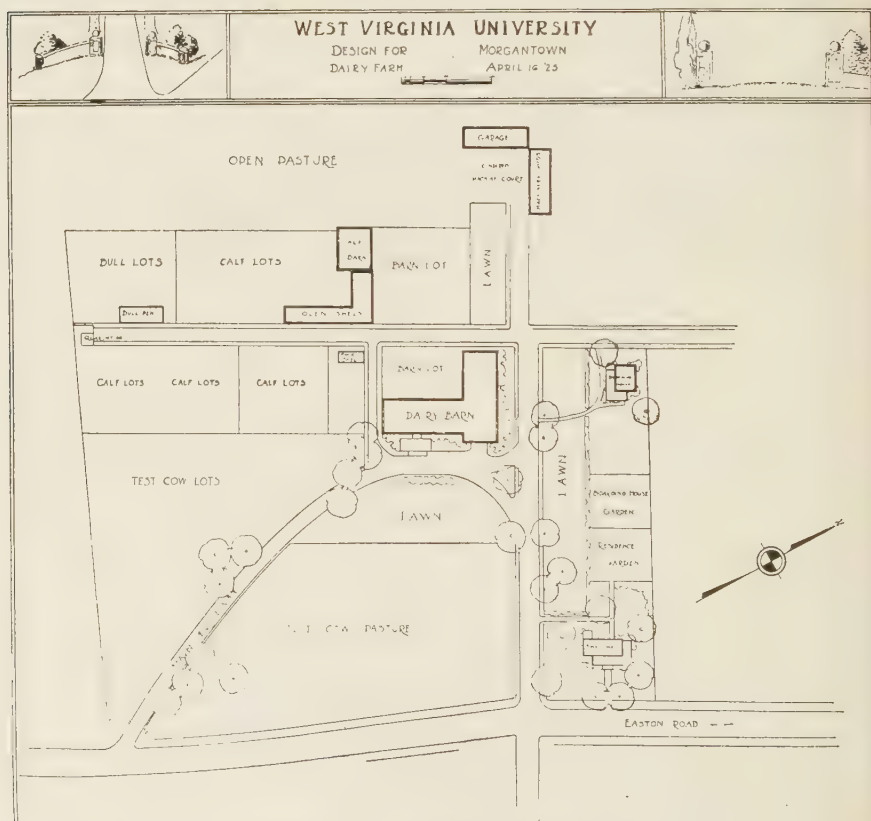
Only by planning for the future in a definite way as shown in this dairy farmstead landscape plan can a convenient and attractive farmstead layout be brought about.
